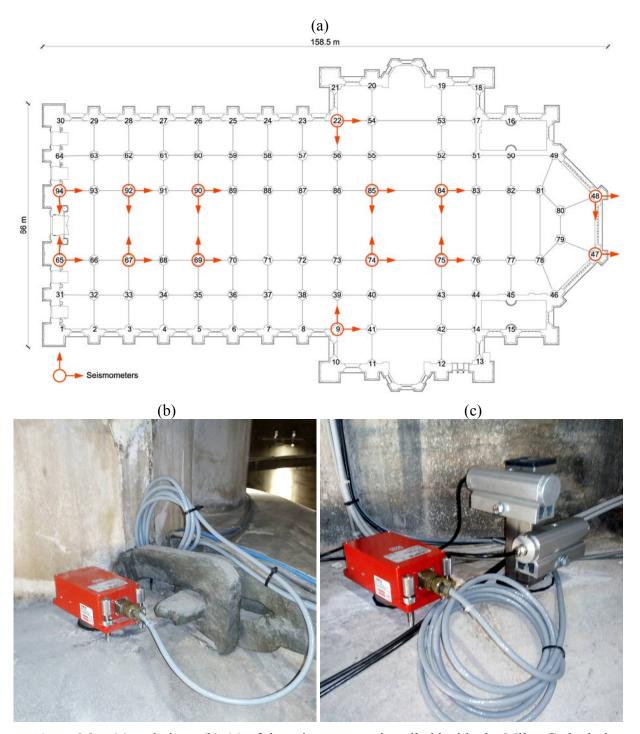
Map (a) and views (b)-(c) of the seismometers installed inside the Milan Cathedral (dimensions in m)
